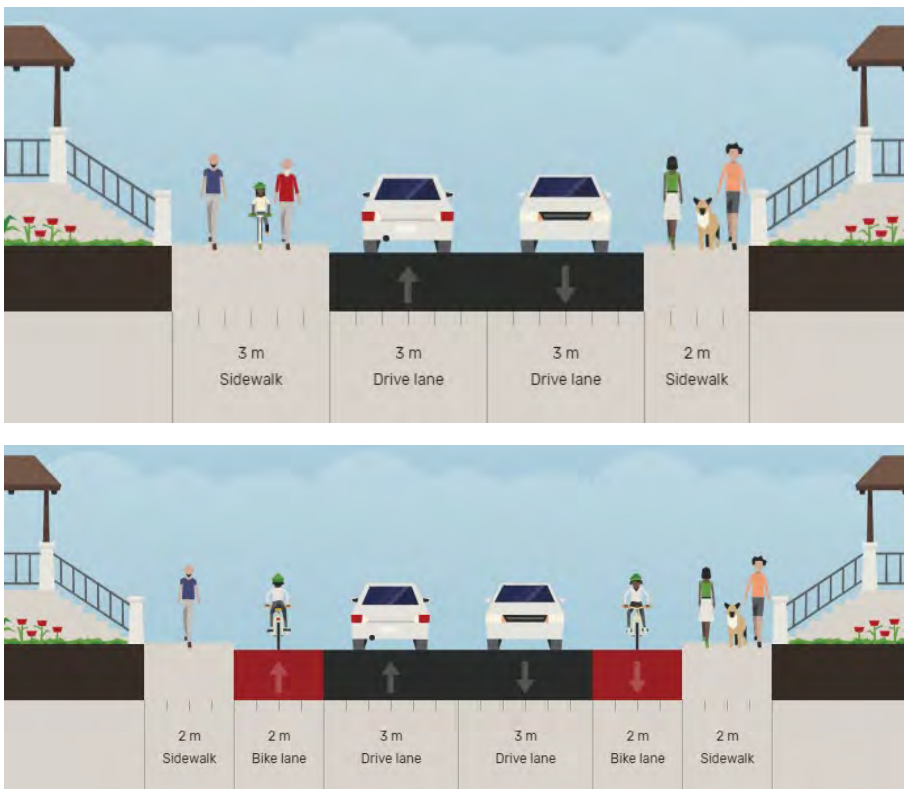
Kilmoney Road Lower Option 5 – Cross-sections
